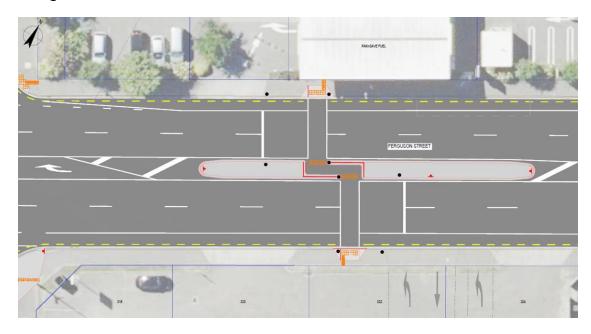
Concept of Plan of Proposed Signalised Pedestrian Crossing (note: some minor changes have been made)
